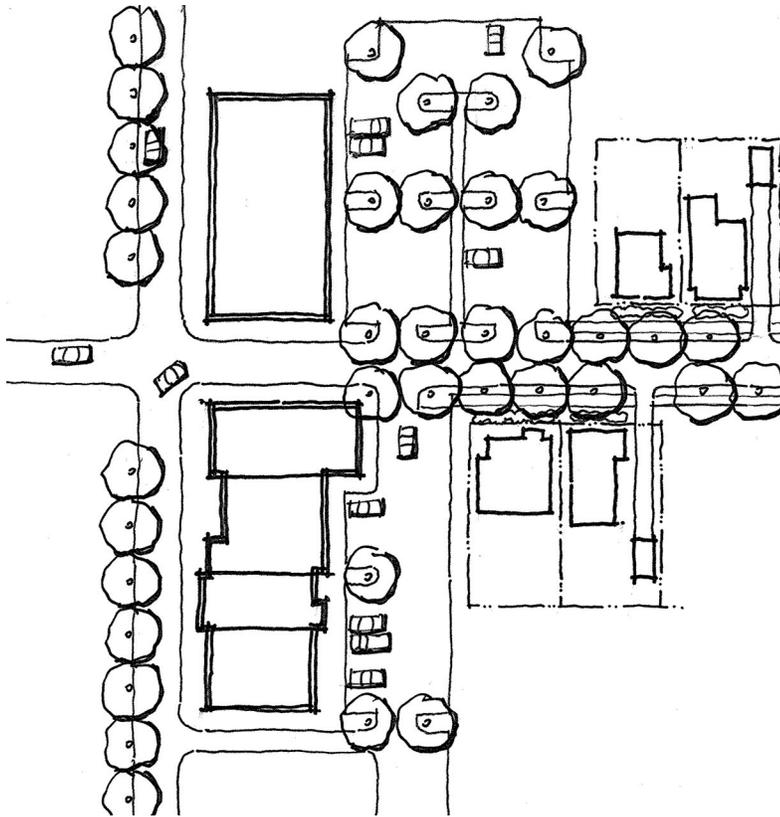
Preferable Orientation for Buildings in the Downtown District. The fronts of buildings are along Lafayette Boulevard with a minimal setback. Parking is accessed from side streets and located behind the buildings. Parking lots supporting several buildings are connected.
